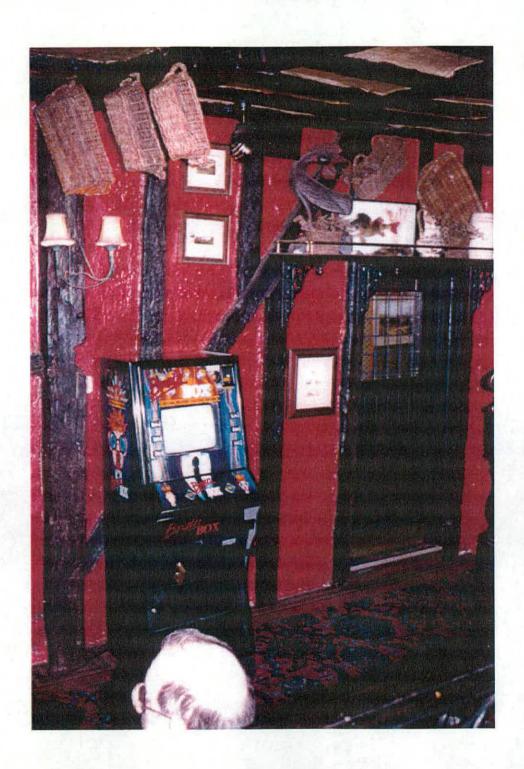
Wall framing, rear range, north wall, prior to alterations 1996
